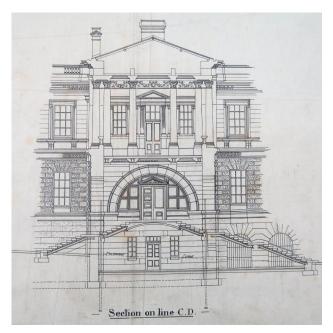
Section C-D of Link Building (generally as constructed) showing the eastern façade of the Link Building behind the front portico
